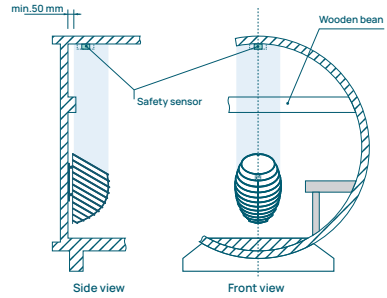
Installing the safety sensor on the ceiling in barrel saunas: wall-mounted heater
